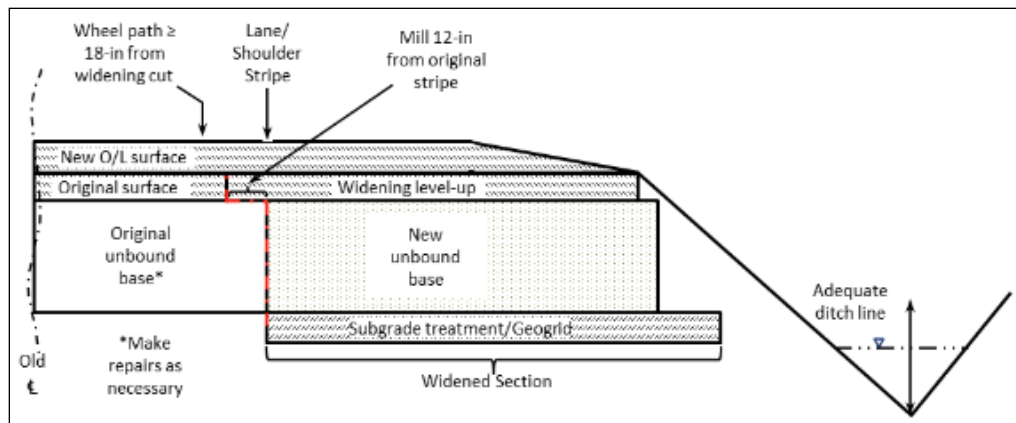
Maintain Existing Cross Section throughout Widening (1).
